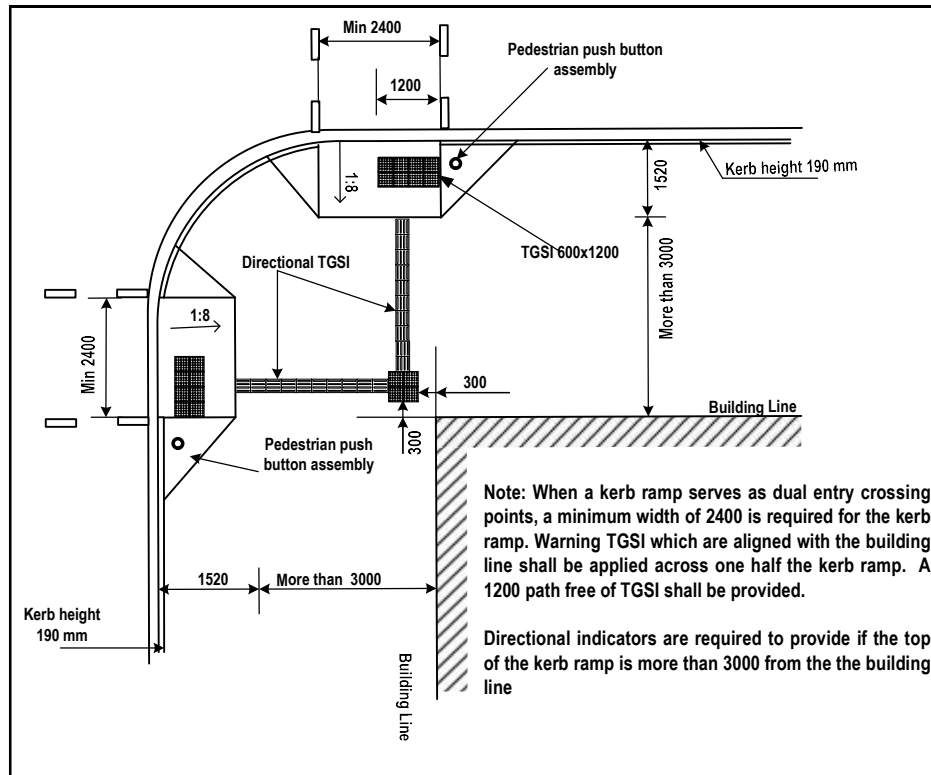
Right angle intersection, dual entry crossing, 190 kerb height, 1:8 kerb ramp, top of the ramp greater than 3000 from the building line
